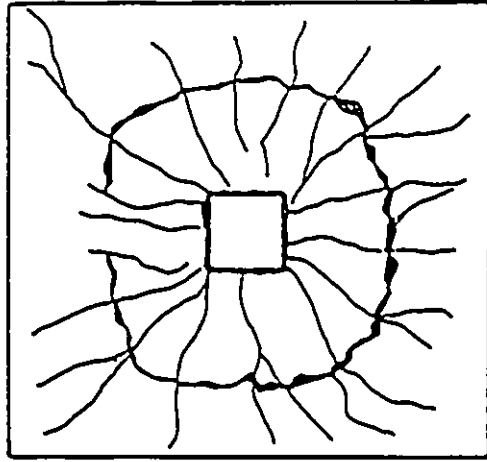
Typical punching failure of interior columns (after Van Dusen)
